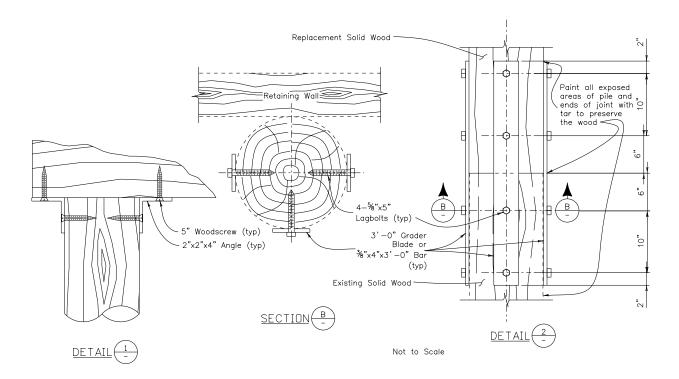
(G)-8 Sample Details of Replacing Portion of Timber Pile
